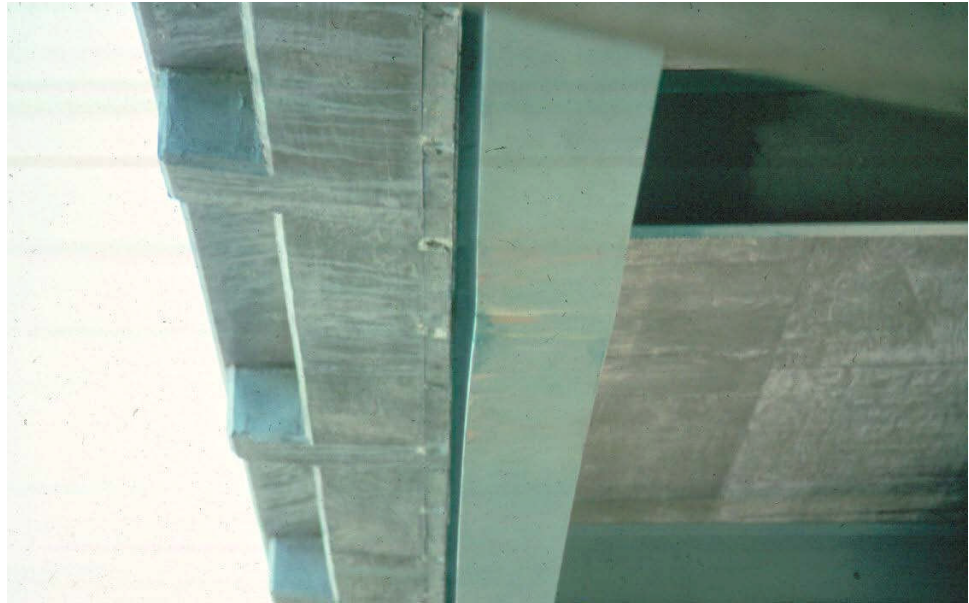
Collision Damage to a Deck Girder Bridge
